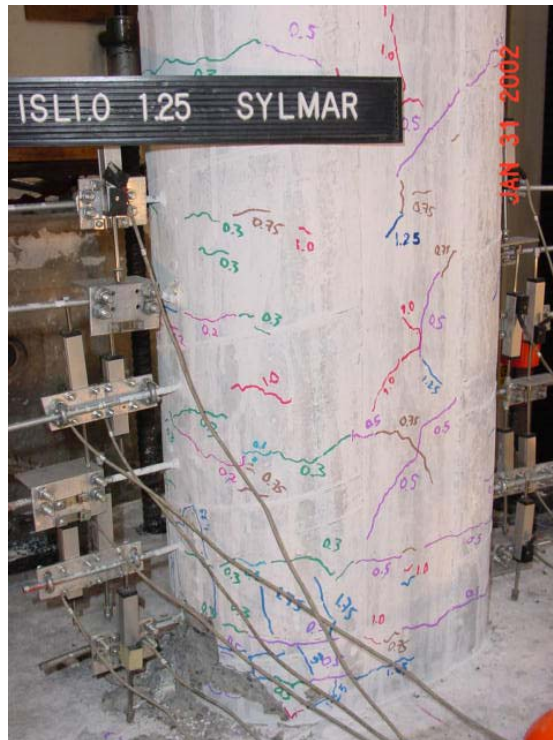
Increasing of Cracks and Spalling ($\mu_d = 2.8$) Specimen ISL1.0
